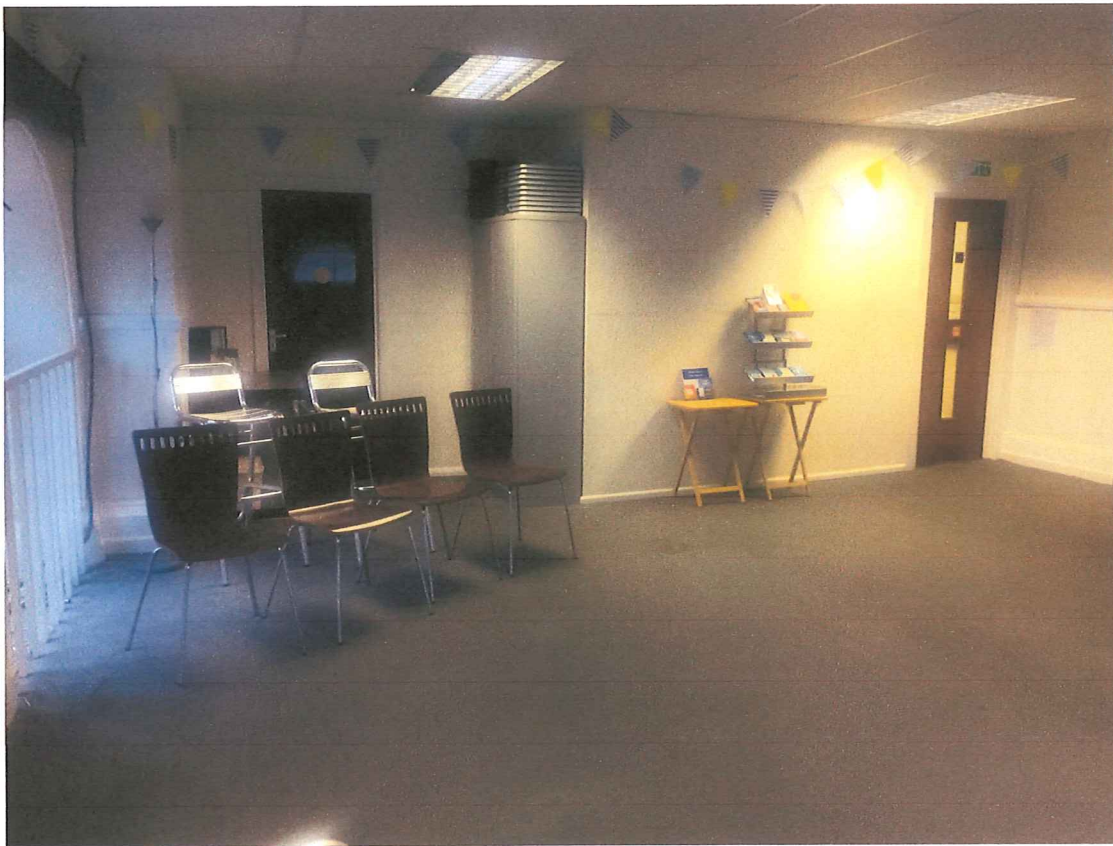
Door D.12 to left and Door D.9 to right hand side.
